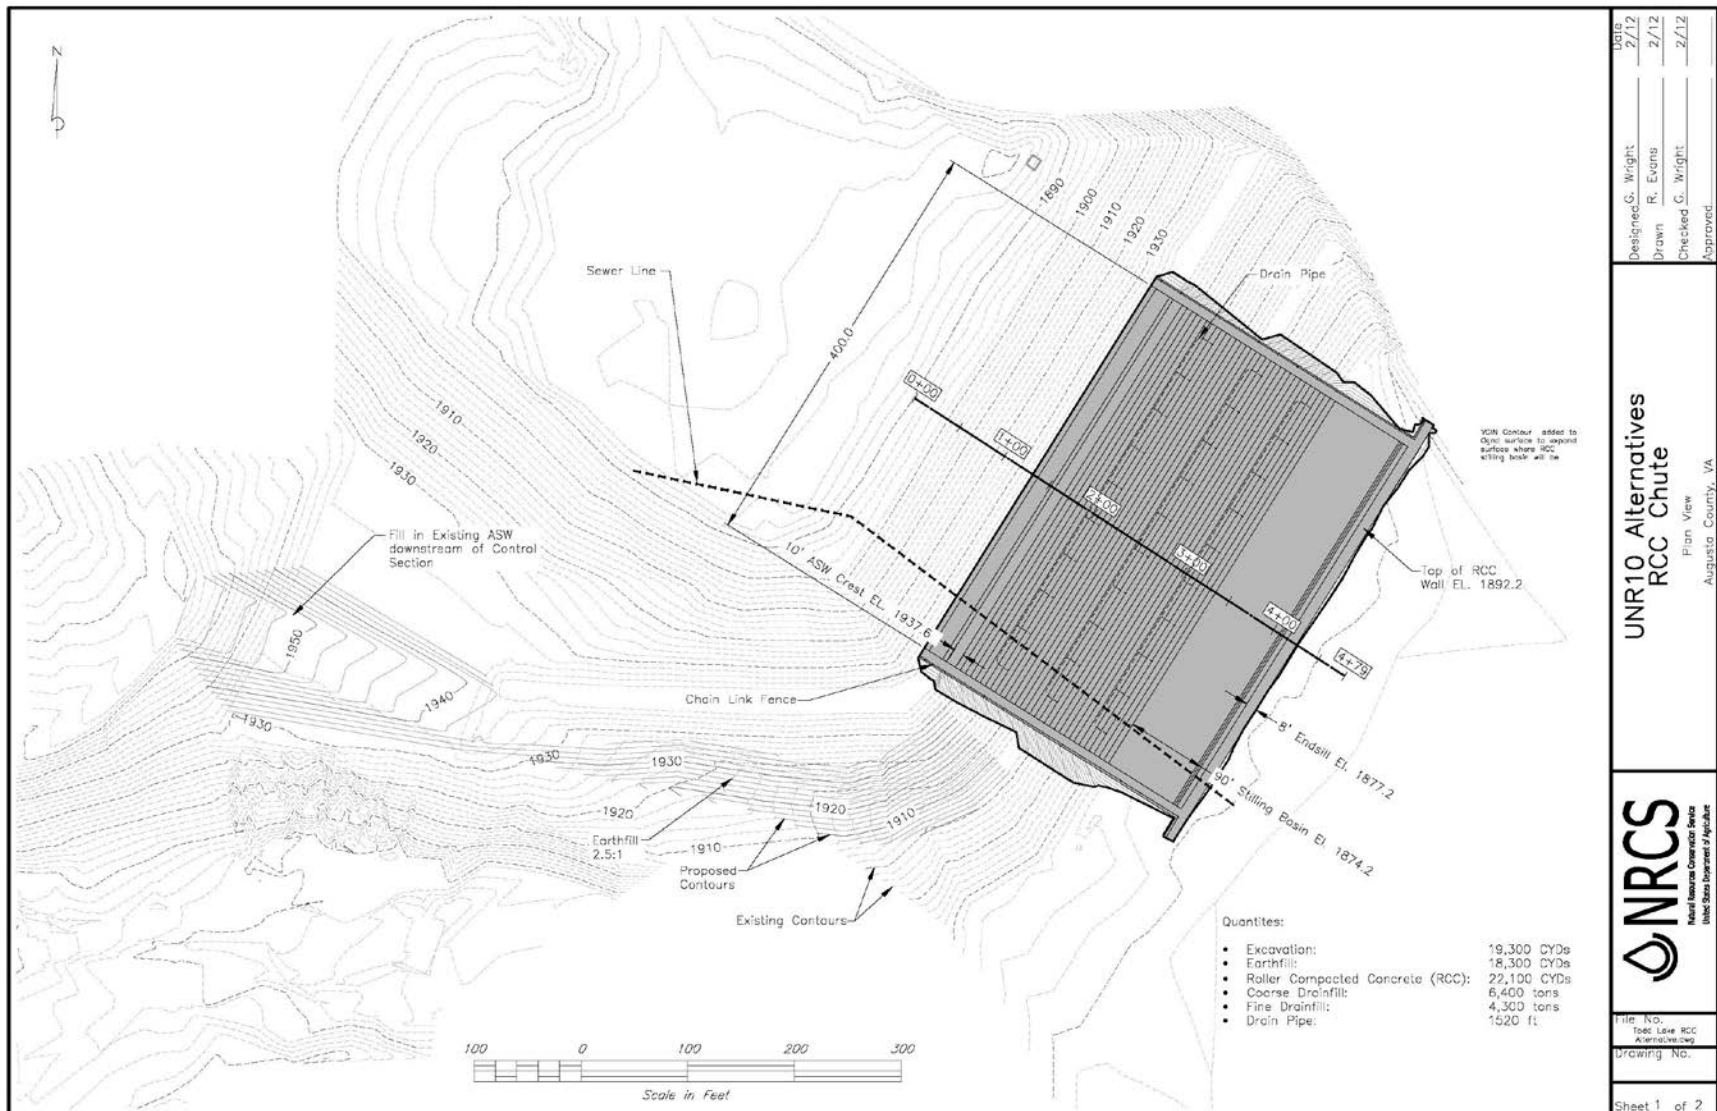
Plan view of site with a Roller-Compacted Concrete Chute auxiliary spillway.
